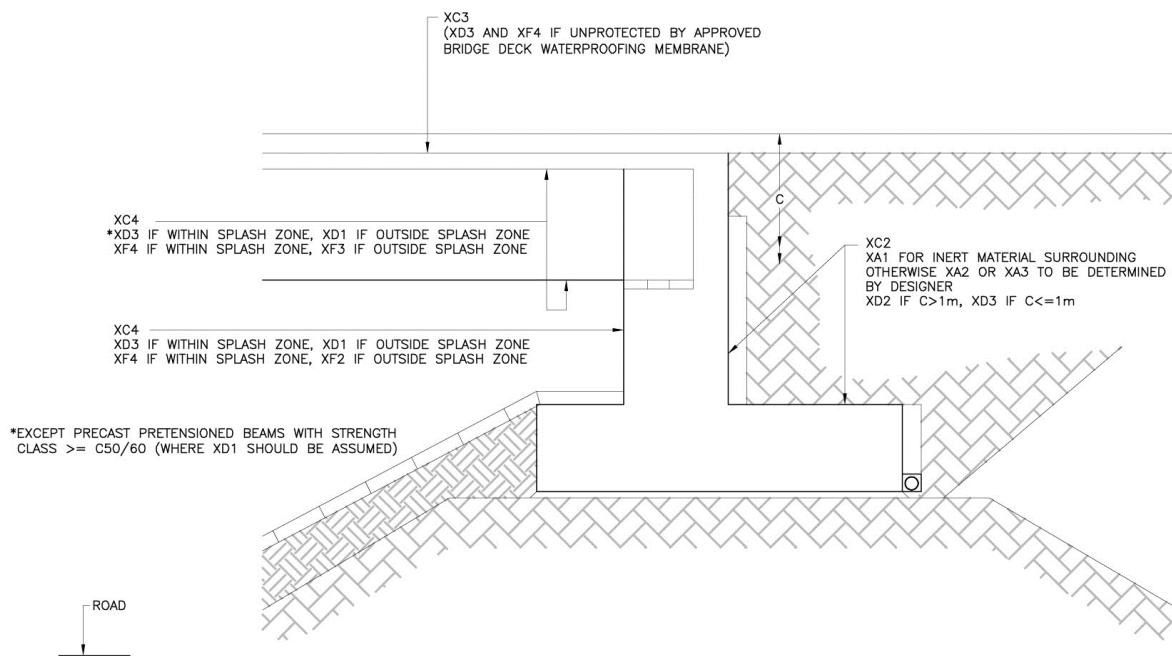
Overbridge Structure (Road Over Road) – End Support
